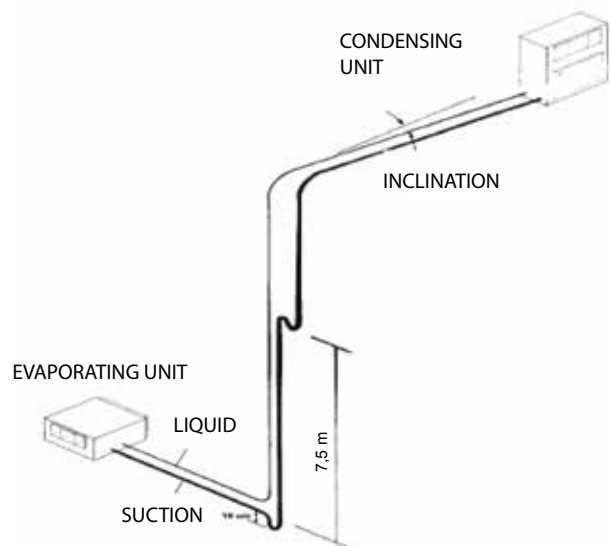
Assembly Condensing Unit over Evaporating Unit.
